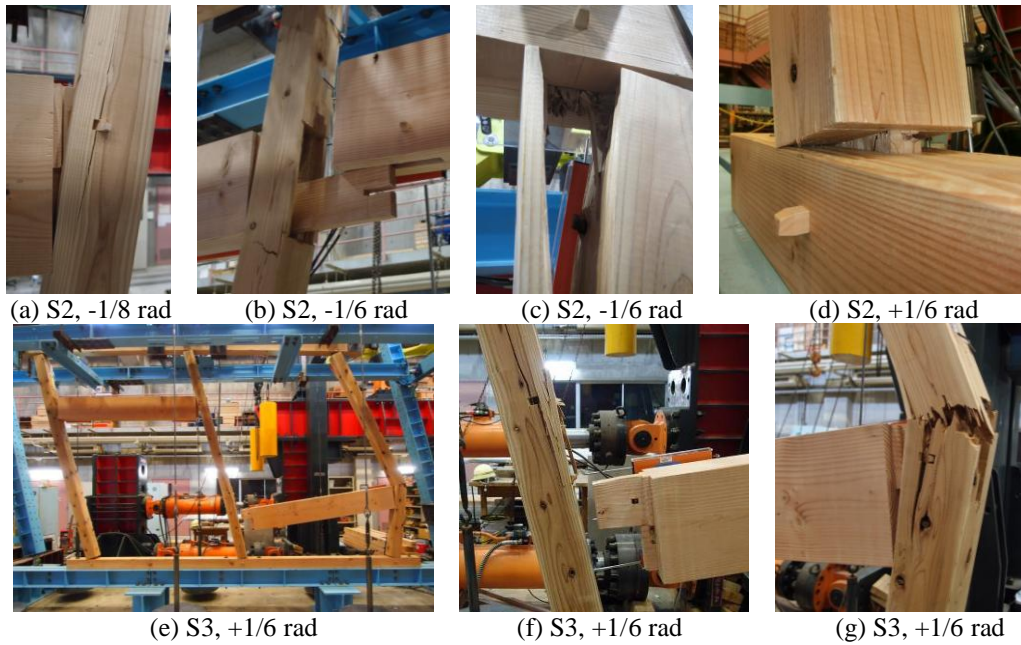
Remarkable damage: (a) right-column splitting, (b) middle-column fracture and tenon failure parallel to grain, (c) right capital splitting, (d) left-column base fracture, (e) broken specimen, (f) middle-column splitting and beam tenon offset, (g) right-column fracture.
